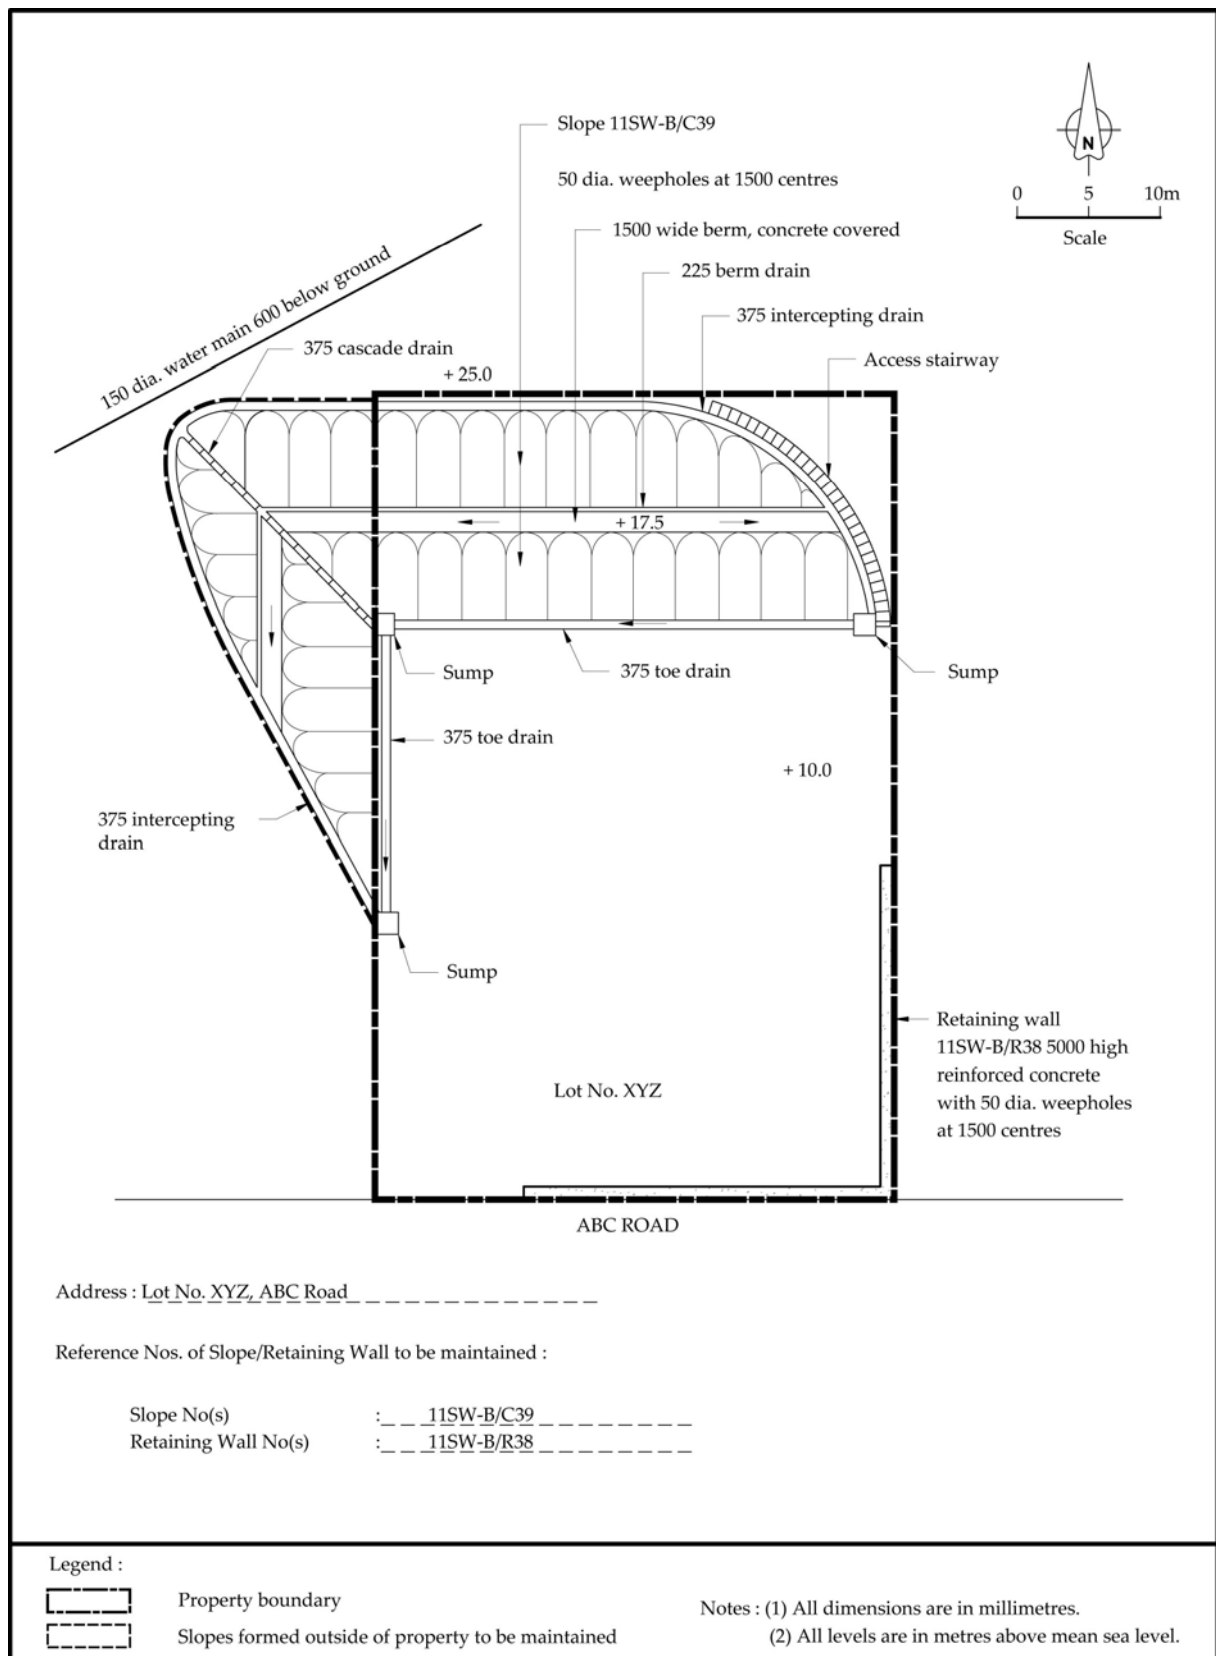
Typical Plan of Slopes/Retaining Structures to be Maintained
